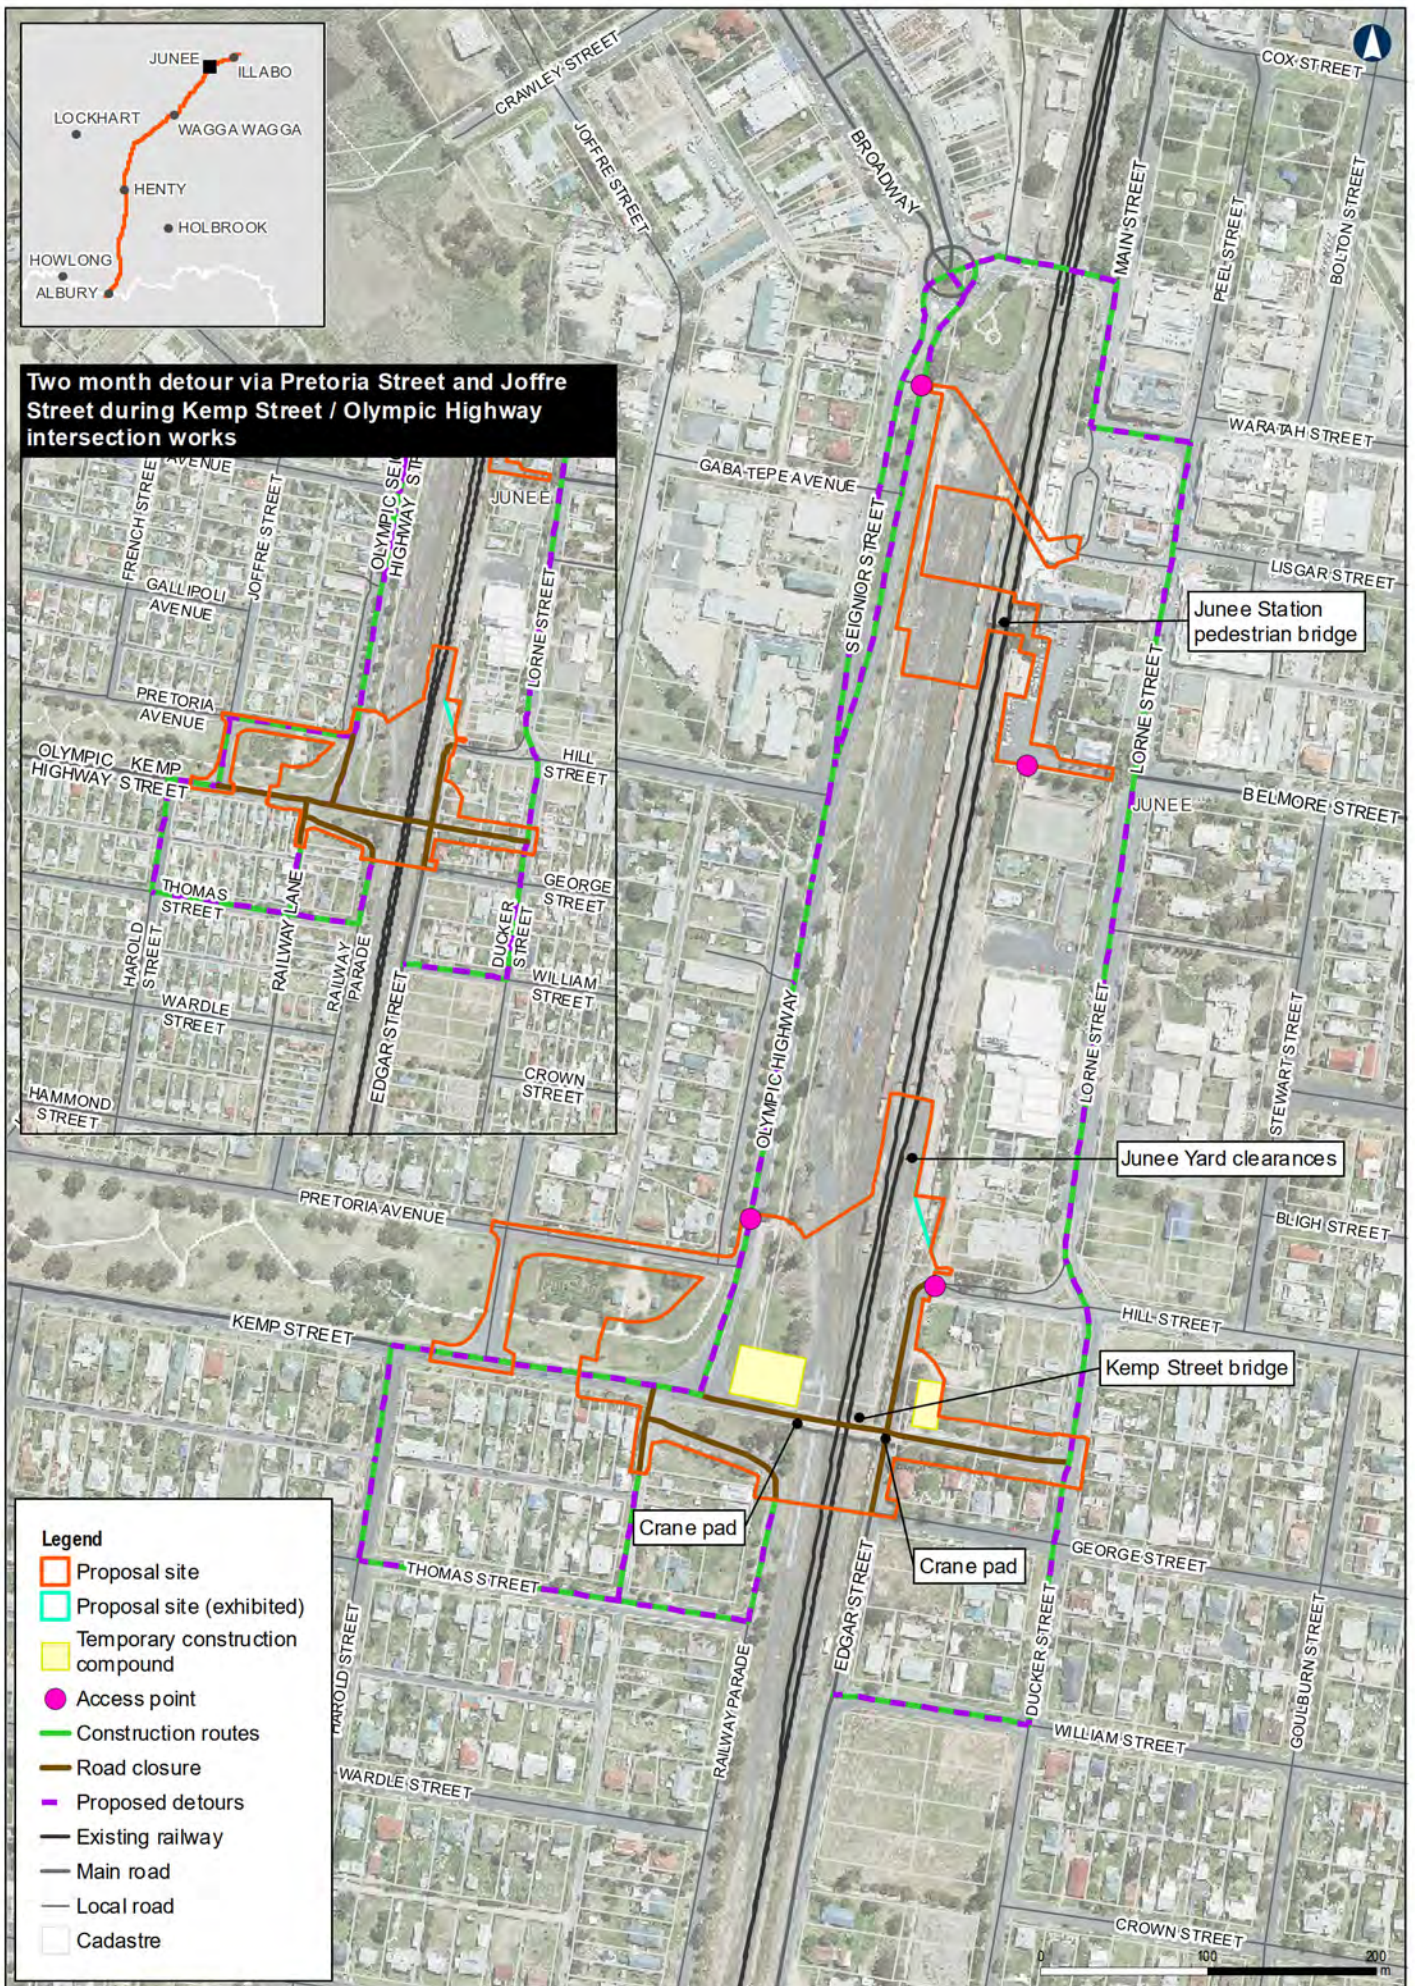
Revised Construction layout of Junee Station and surrounds
